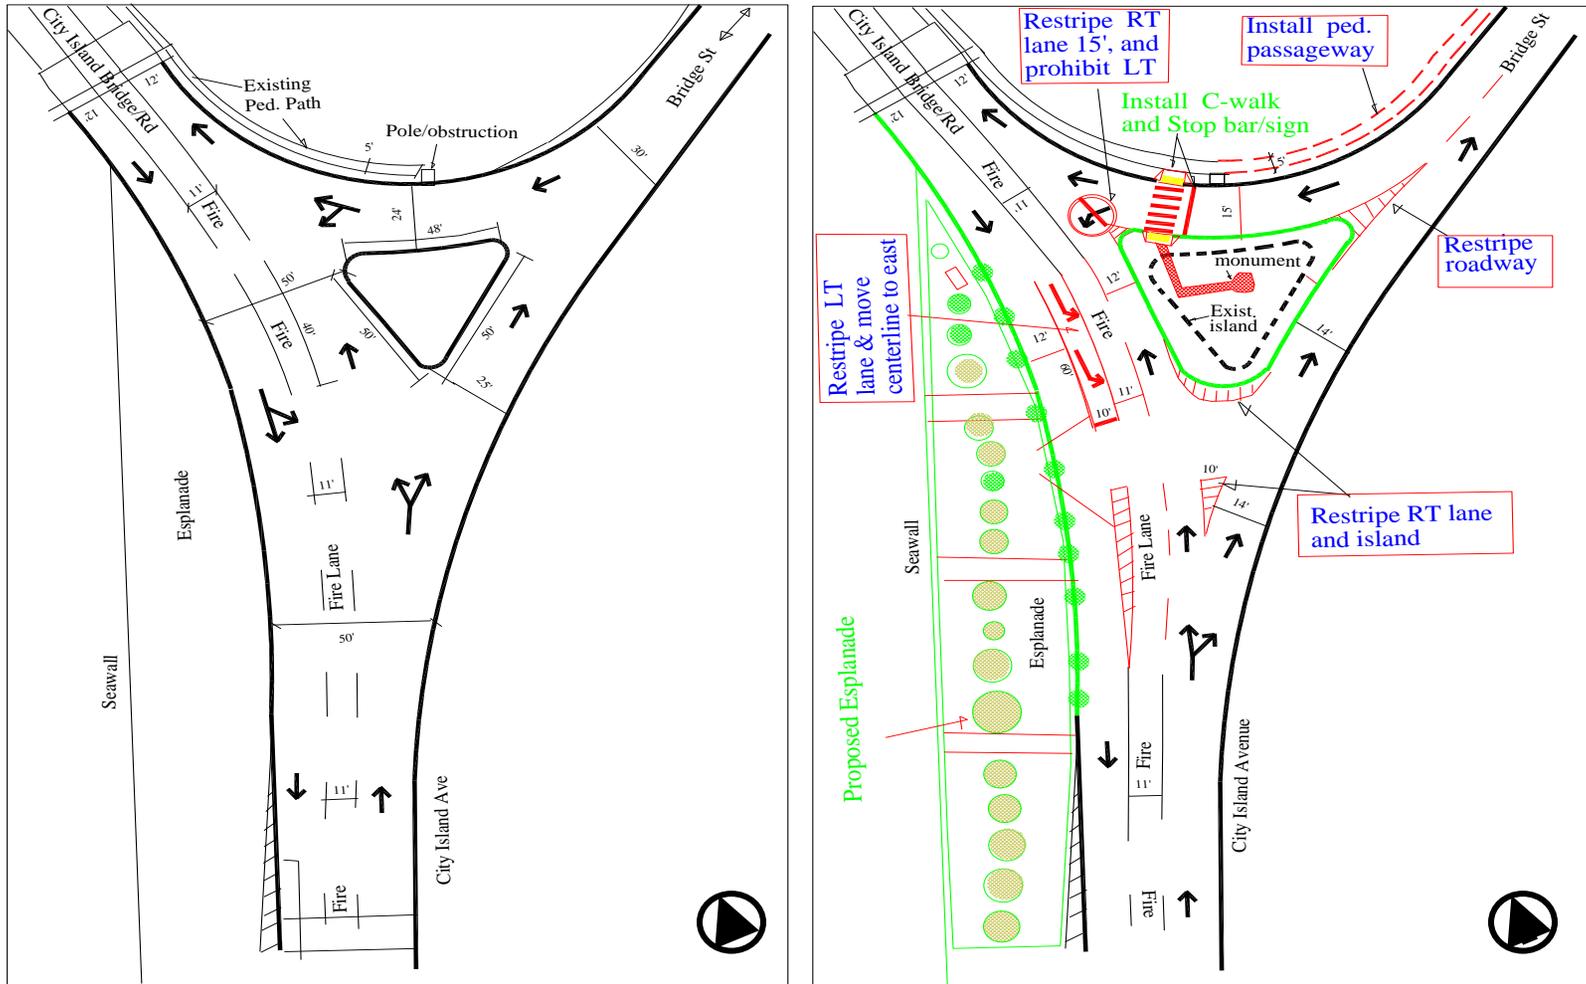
Improvements at City Island Avenue and Bridge Street
